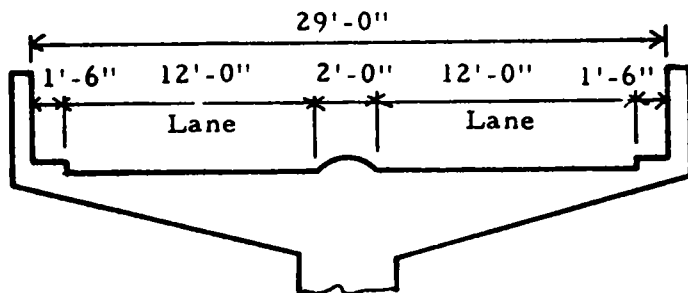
Typical cross sections, Crosstown Busway, Chicago, Ill.
